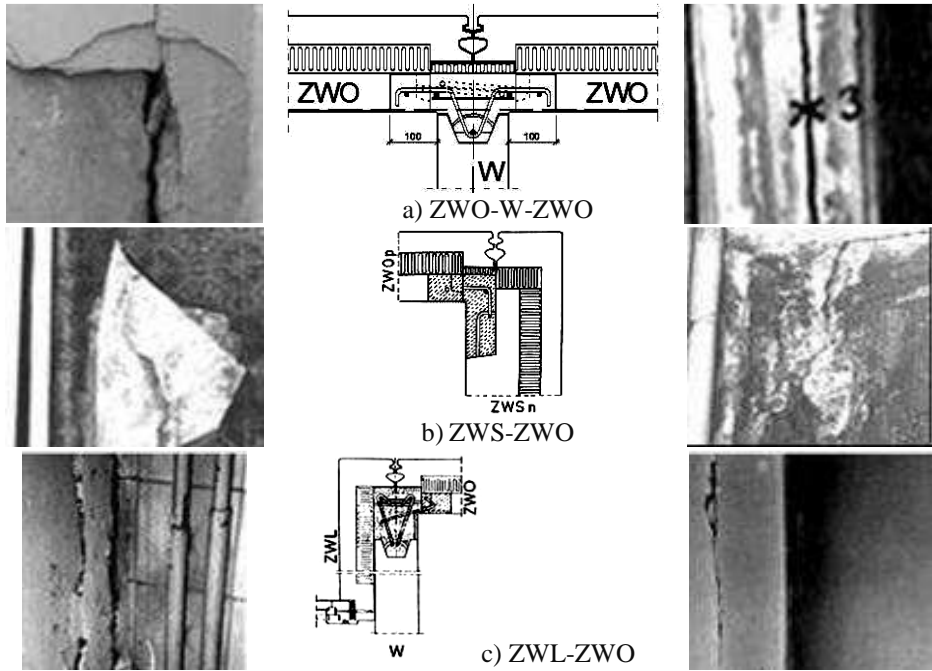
Examples of cracking due to construction defects in the vertical joint
